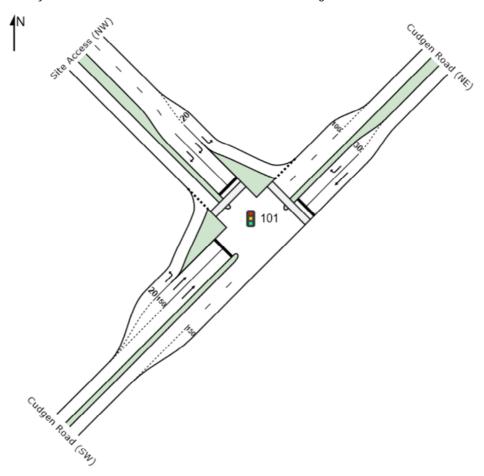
Cudgen Road / Site Access SIDRA Intersection Layout
